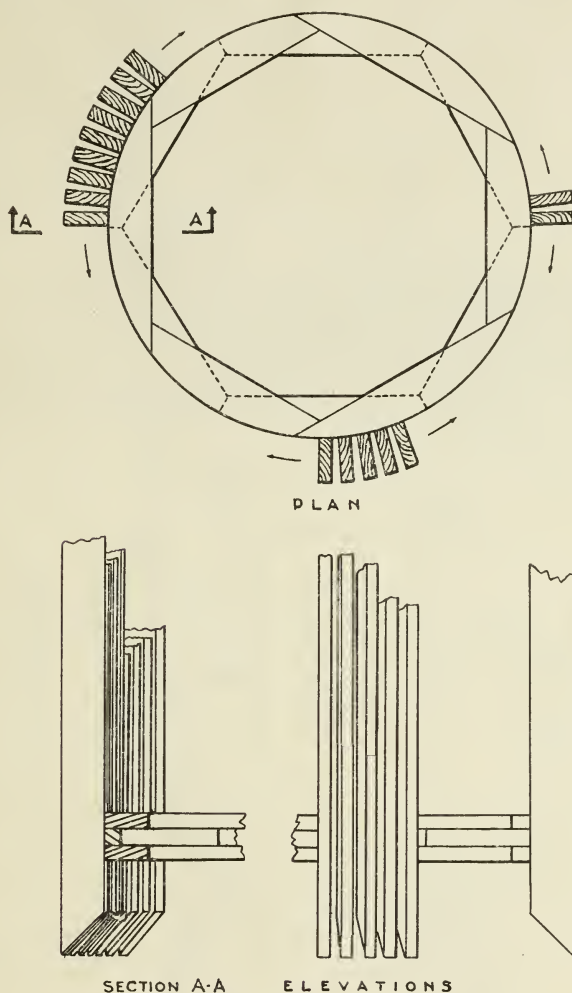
Special cylindrical wood ribbing with planking mounted on edge, facing outward, to make slotted wall for entrance of water.
